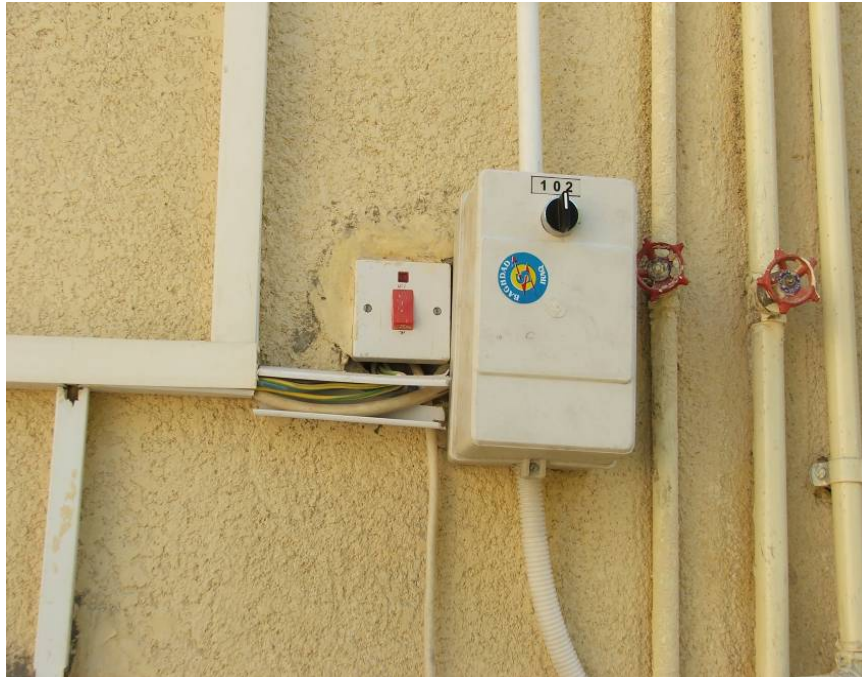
and 21, respectively. Site Photo 22 illustrates exposed electrical wires located in the exterior of renovated building 10.
